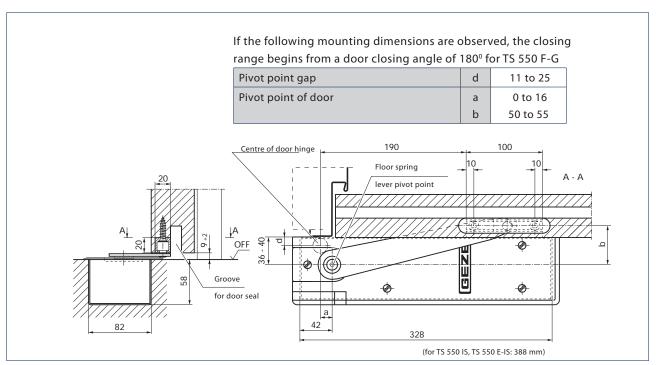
· Installation example: floor spring with lever and guide rail (concealed) to a flush timber door
